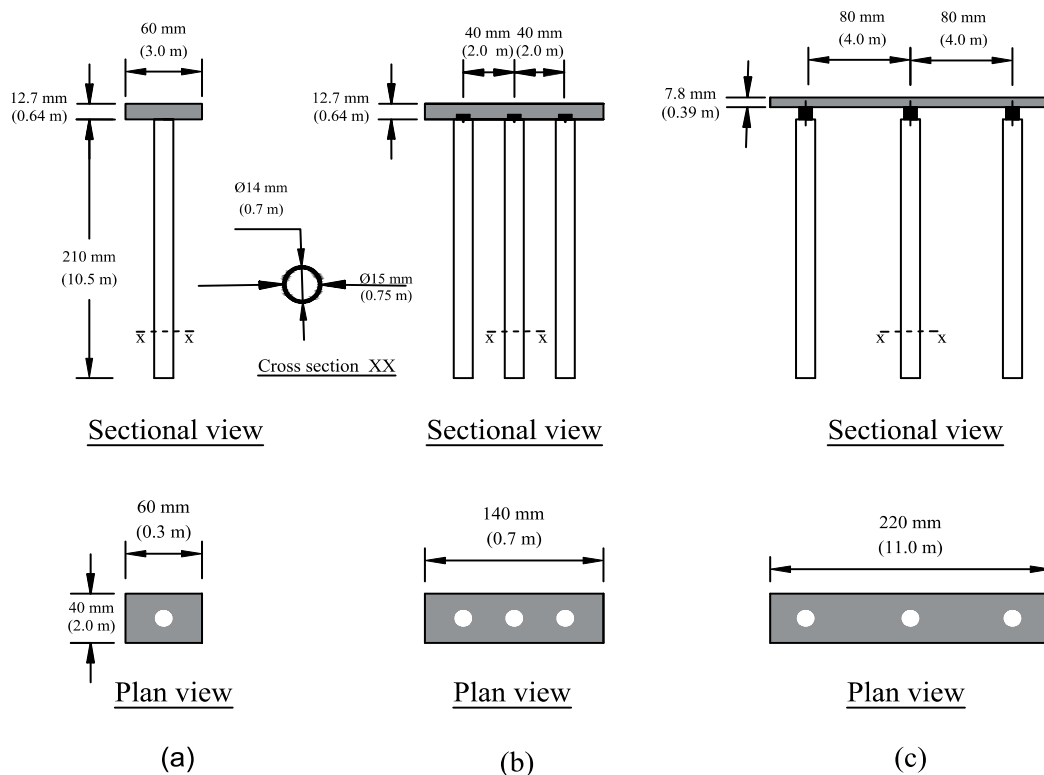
Schematic view of the pile foundations (a) SP (b) CPG and (c) WPG.
